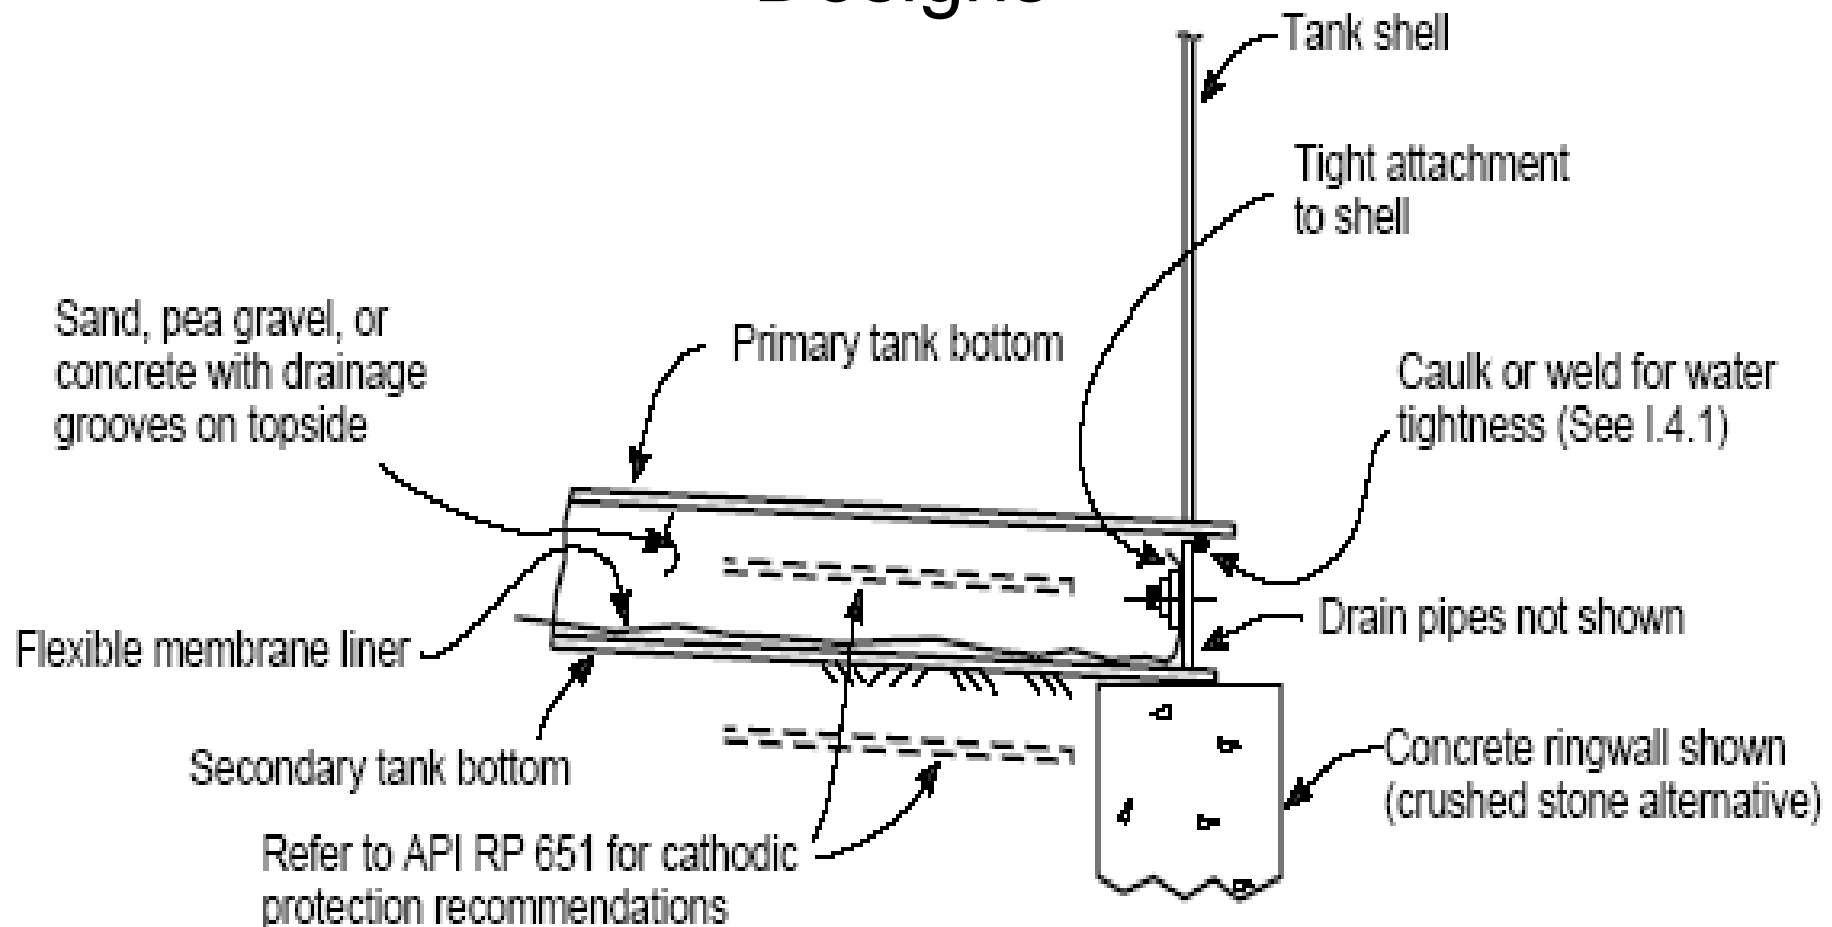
Double Steel Bottom with Leak Detection at the Tank Perimeter (Typical Arrangement)
